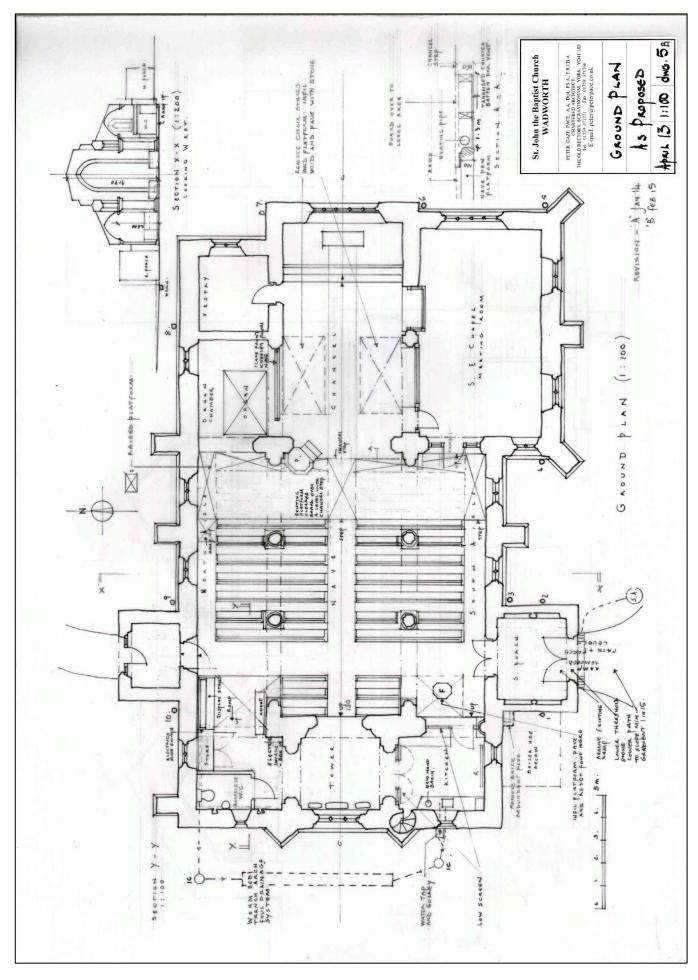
DEVELOPMENT PROPOSALS (Plan provided by Peter Pace Architect)
